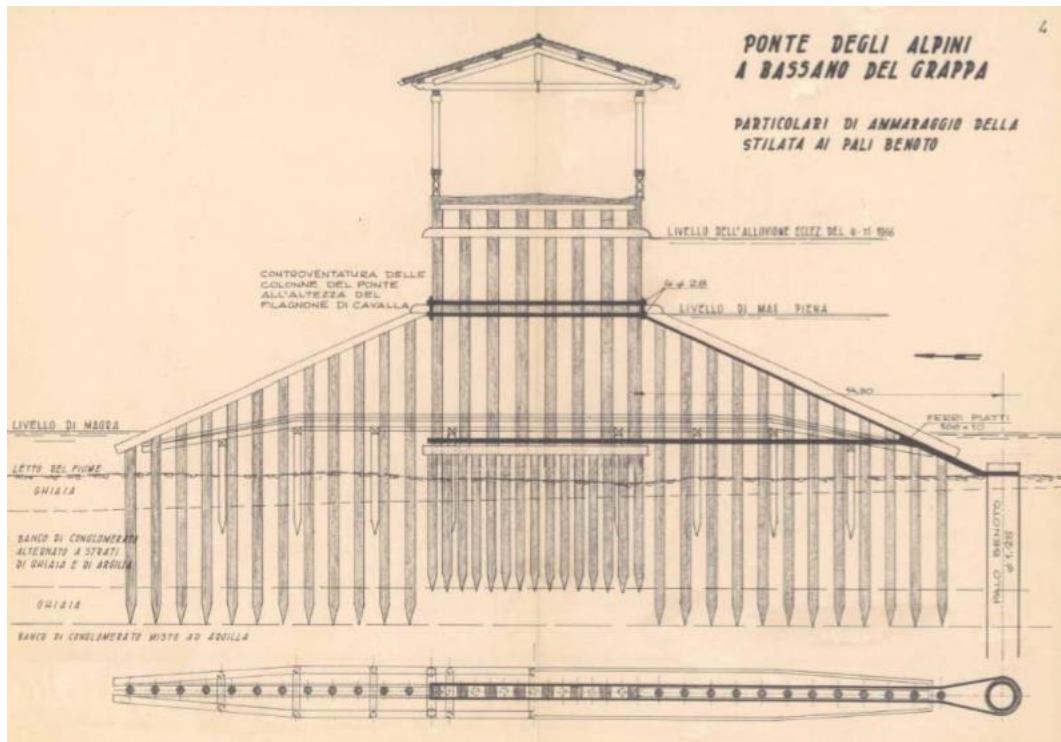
Section of the bridge (1968). Ing.Roberto Benetti
